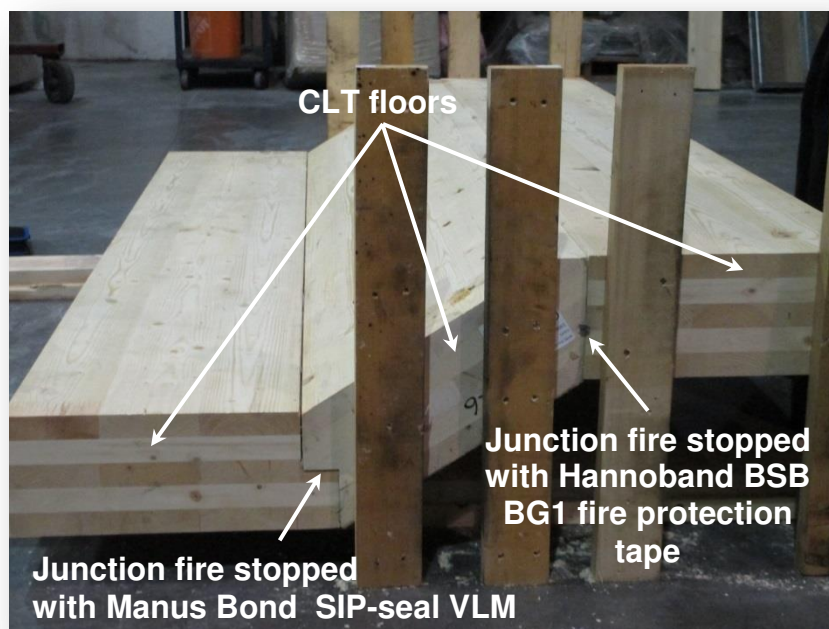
Horizontal linear joint No. 4 (Floor-to-Floor)
